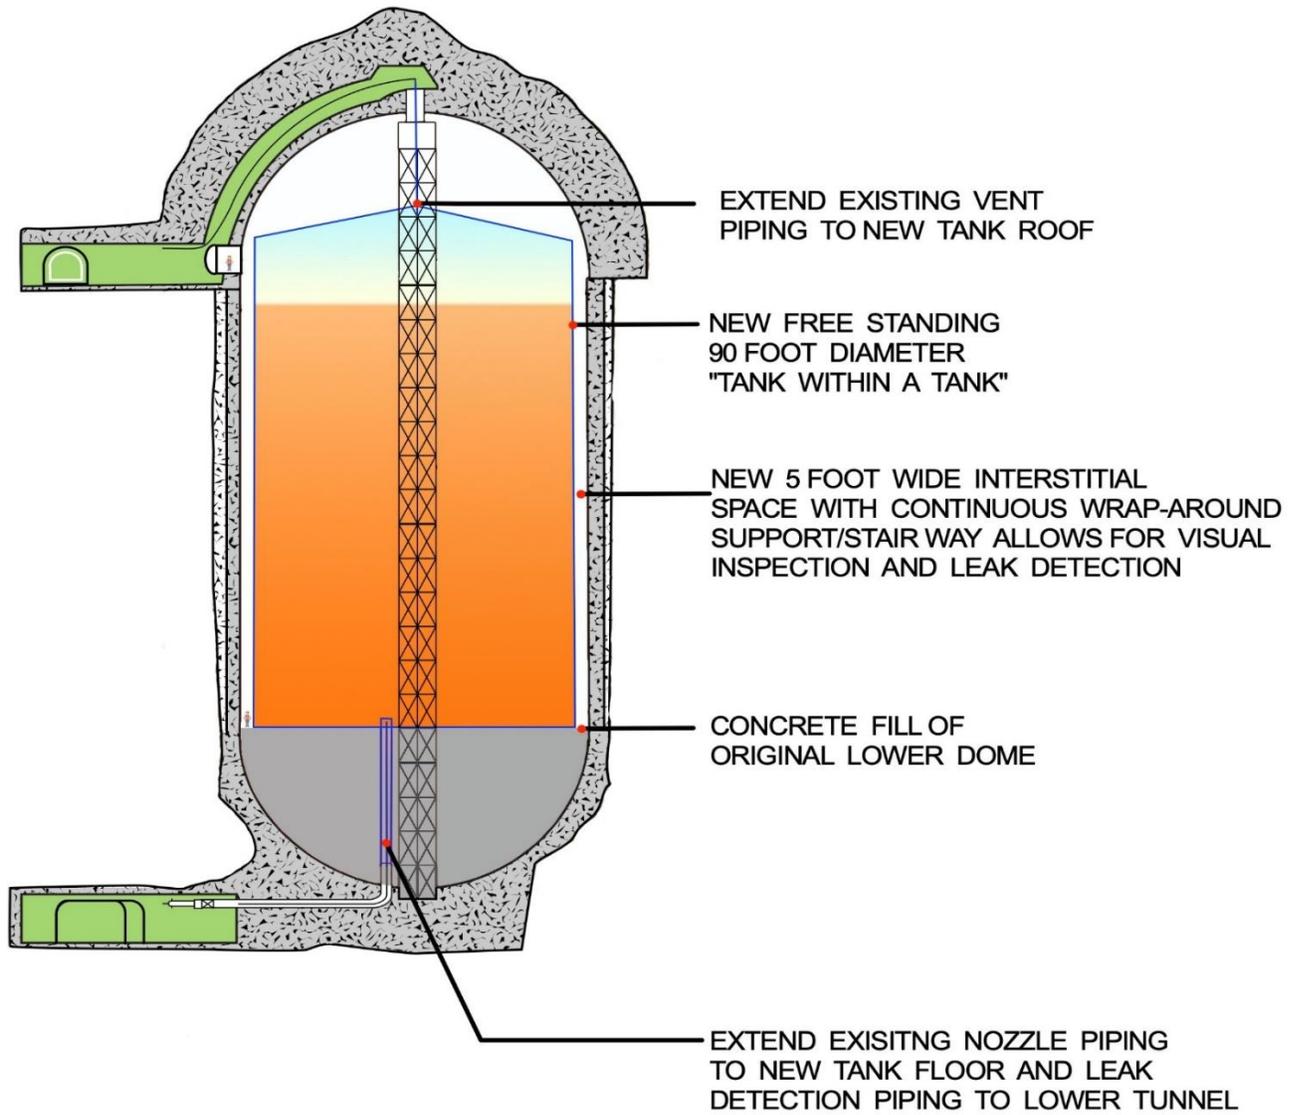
Tank Upgrade Alternative 3A – Typical Tank Section
